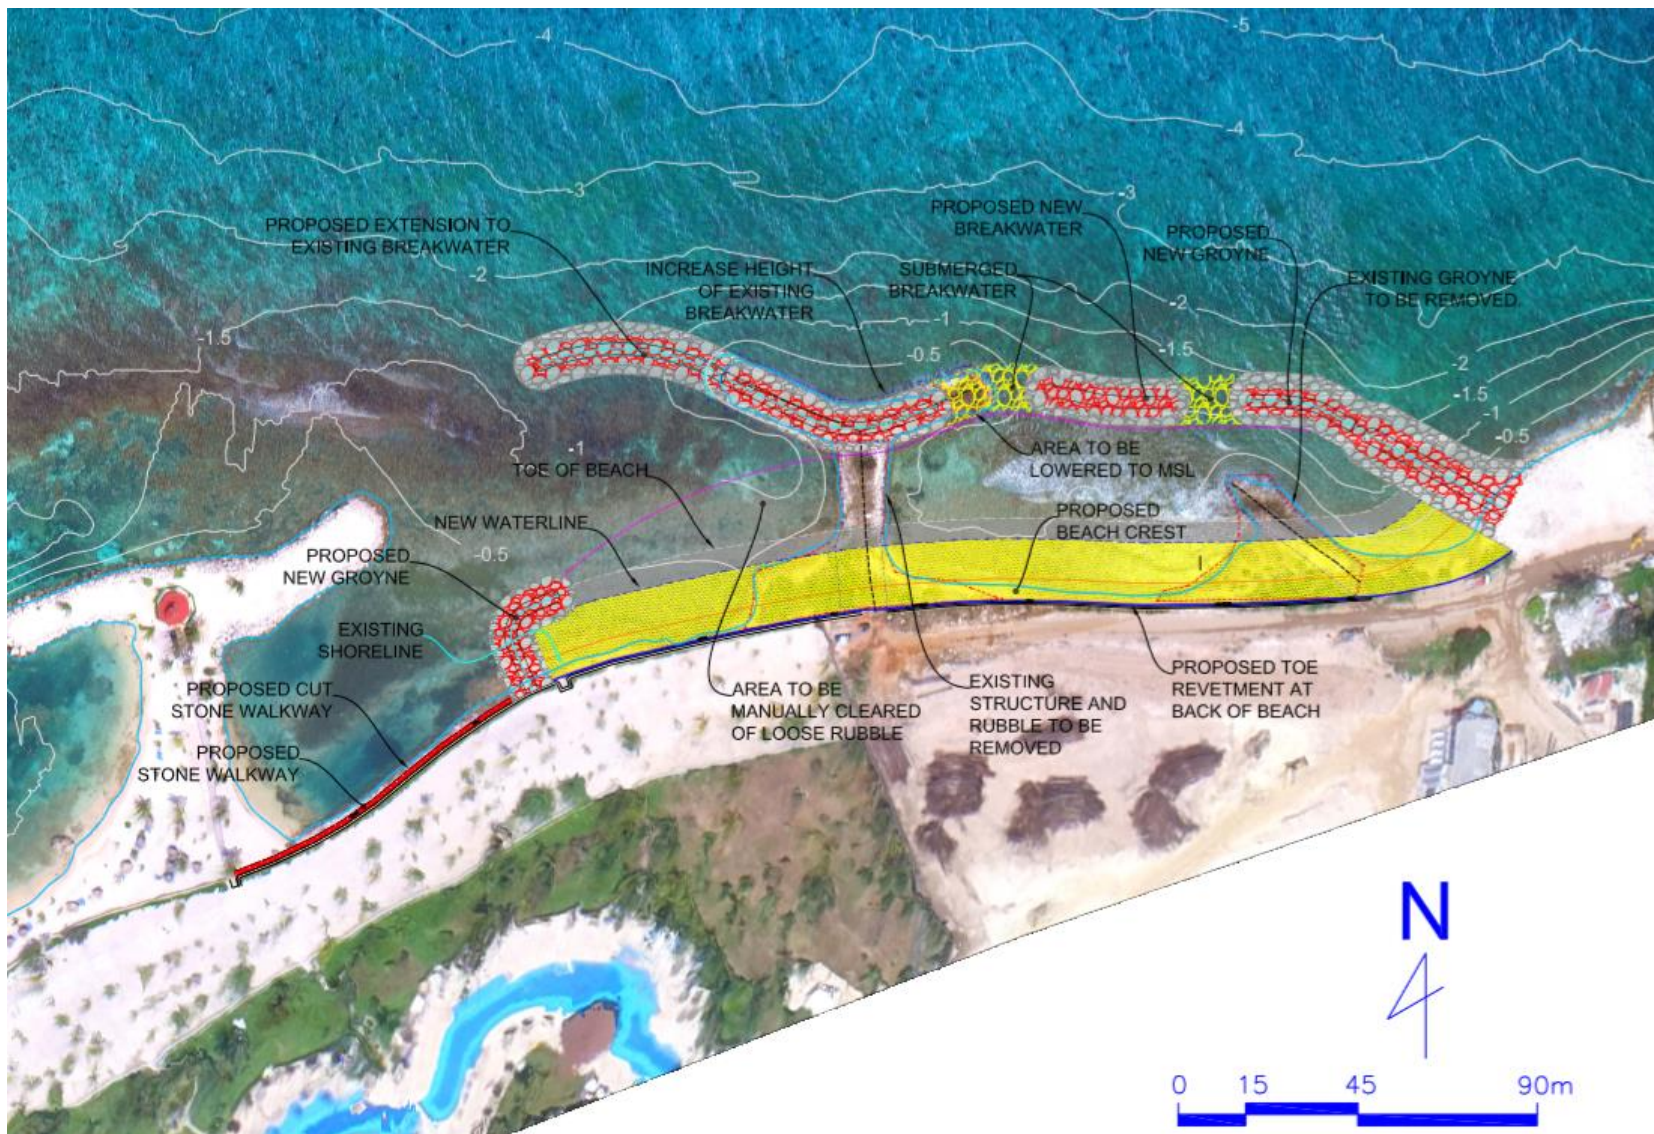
Proposed layout of structures to form “lagoon” beach
